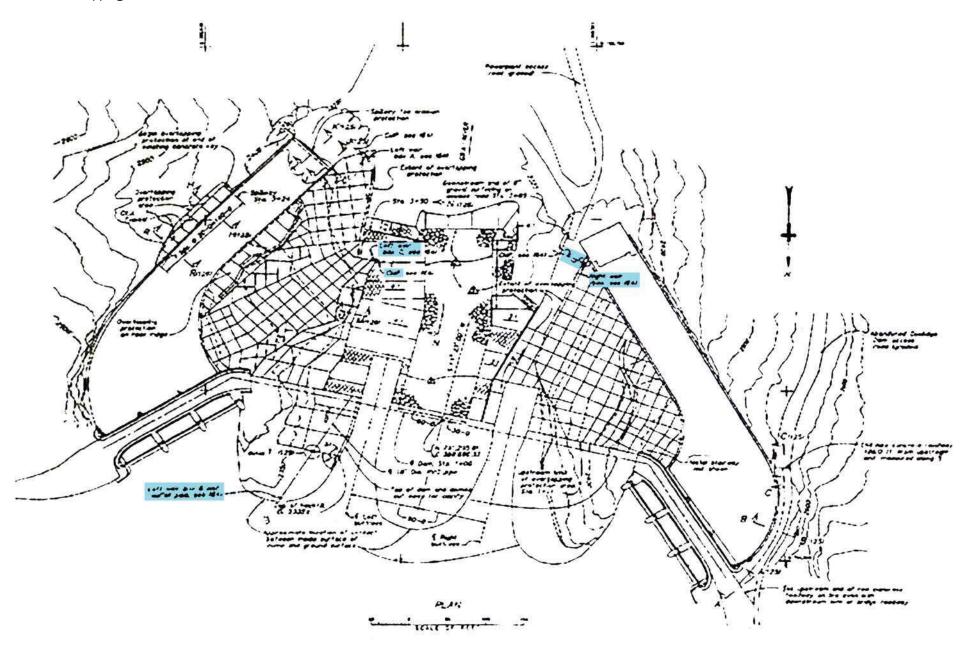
Figure Coolidge -3.—Plan View of Coolidge Dam Modifications (Courtesy of BIA archives).
